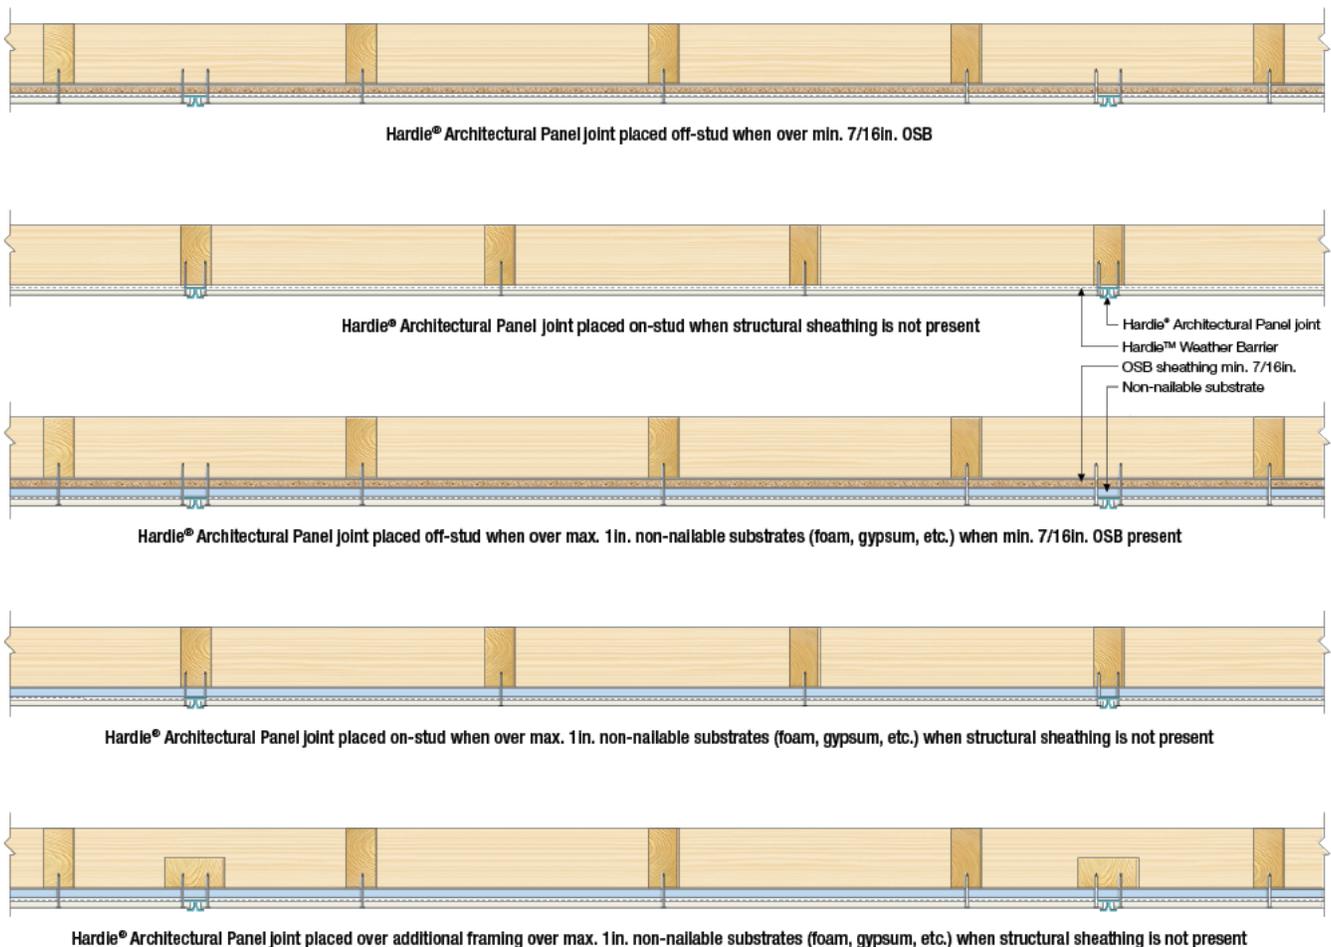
Hybrid - Direct to stud and off-stud nailing when installing non-nailable substrates
